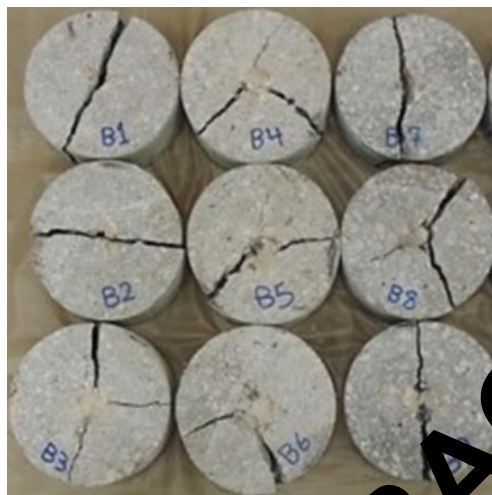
Failure pattern of sisal fibre reinforced concrete with and without latex
